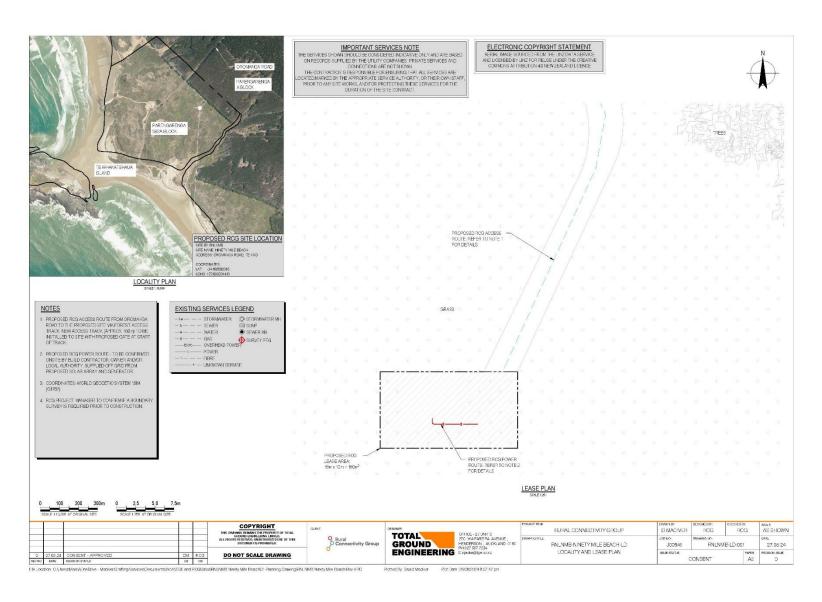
Plans issued for construction, dated 27/8/2024. Source: client.
